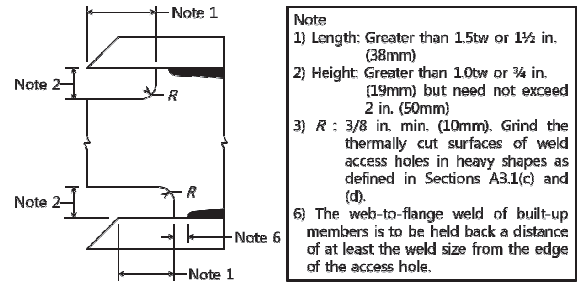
Recommended weld access hole geometry of built-up members per the 2010 AISC Specifications: assembled after cutting<sup>[7]</sup>
